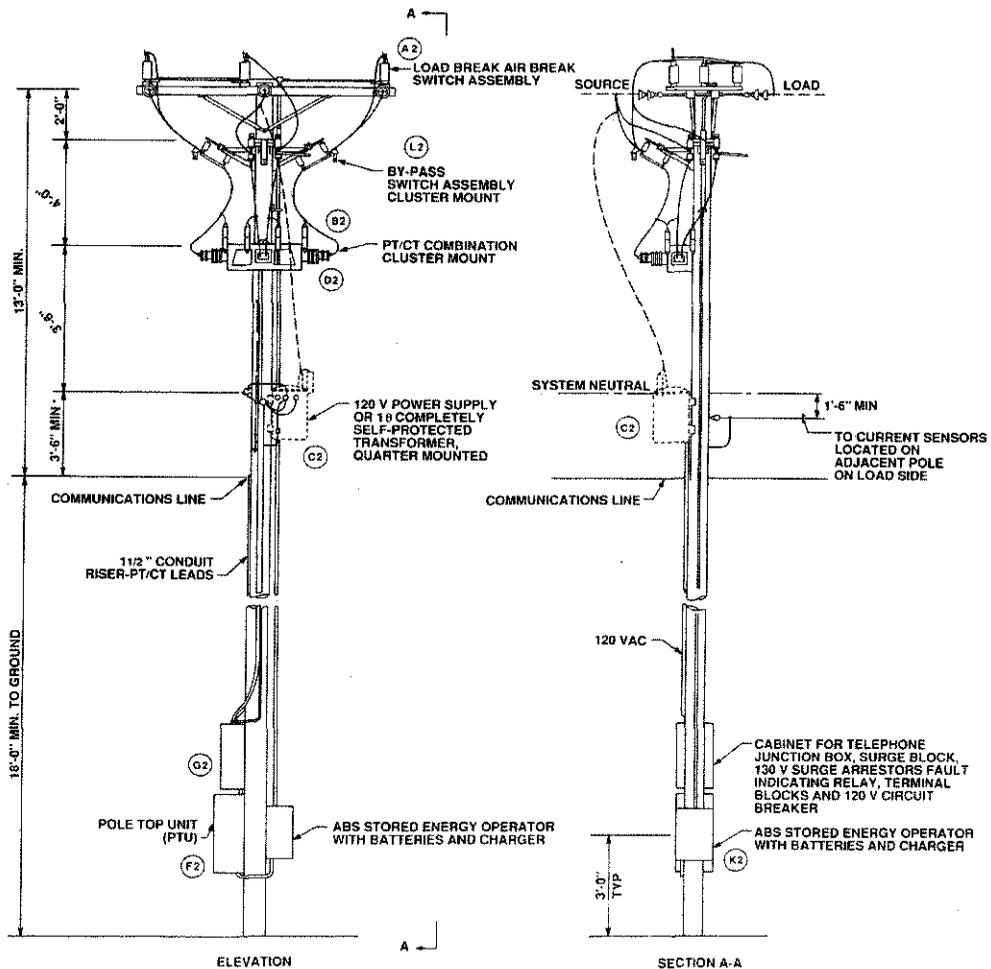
Architectural drawing of load-break switch and feeder monitoring equipment.
